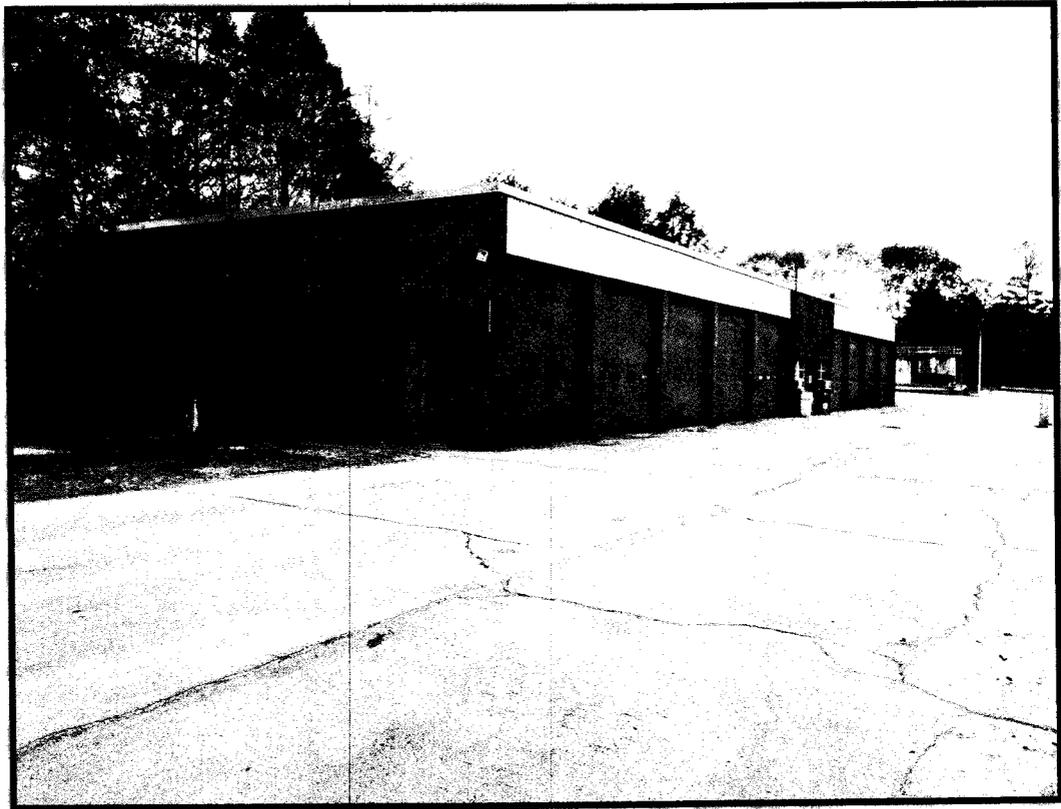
Exterior A side of Building showing Windows, Doors, and location of Underground Septic Tank.
